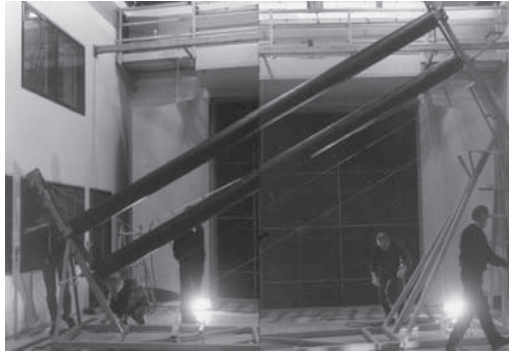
Testing the cables of a cable-stayed bridge over the Øresund Straits.
